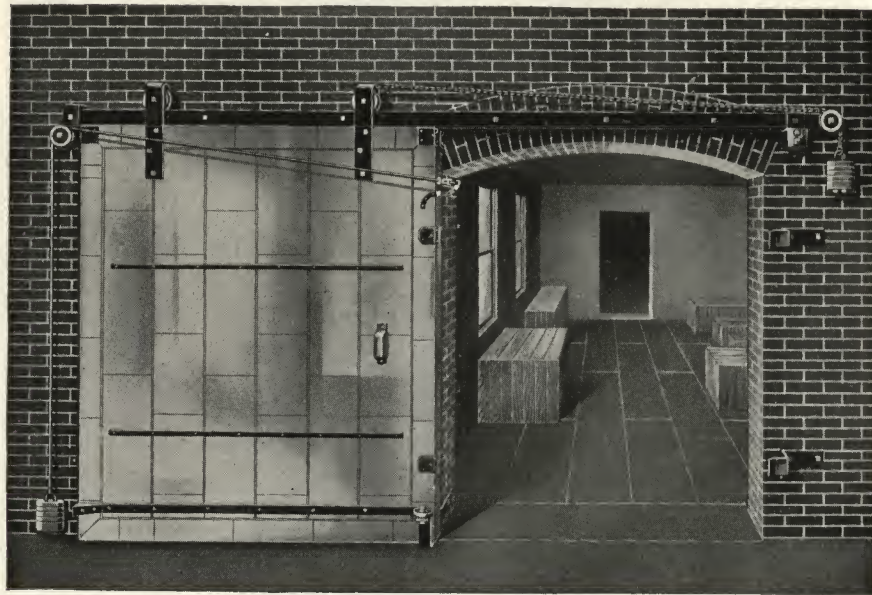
No. 303 Fire Door Fixtures Applied to a Left Hand Tin Clad Fire Door.
